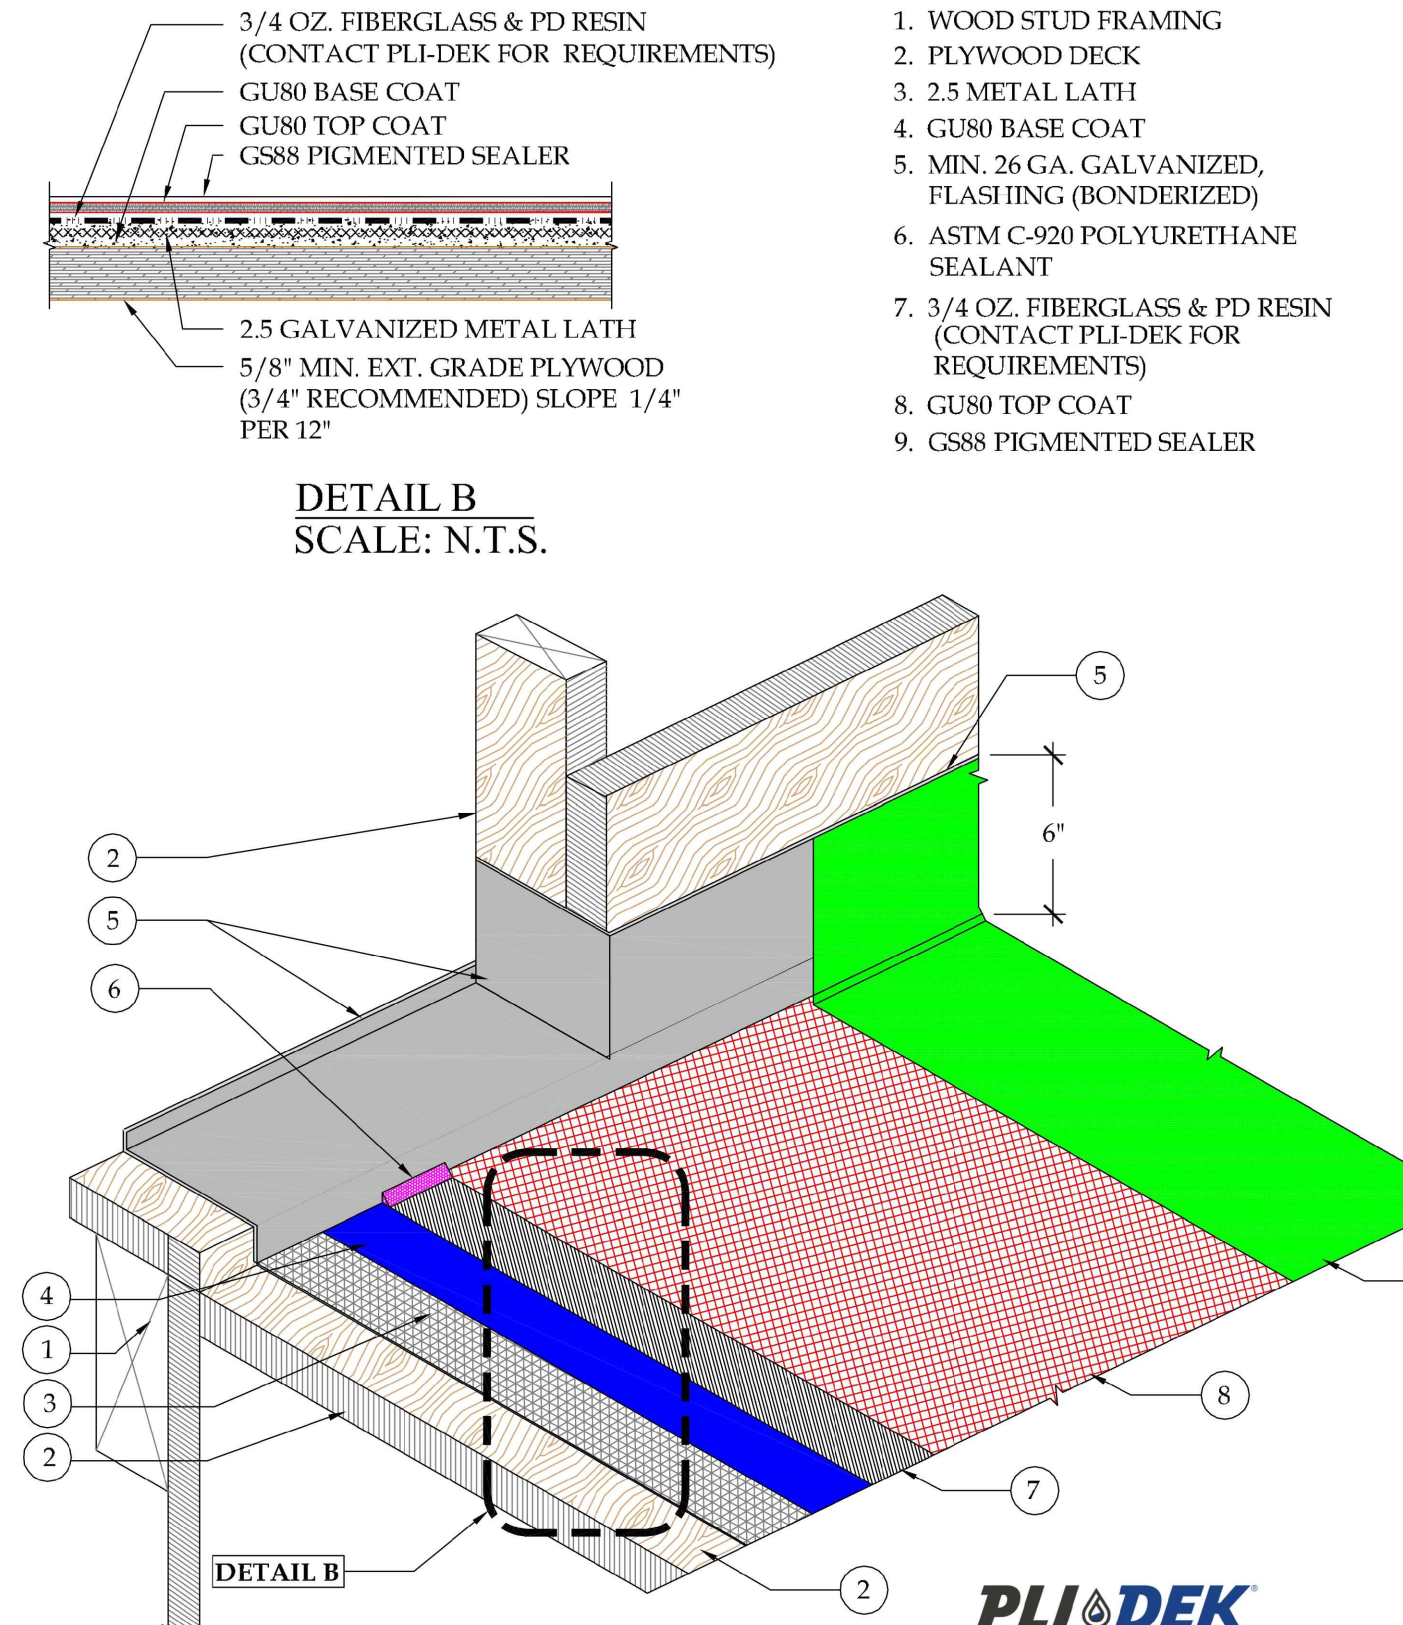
DETAIL-METAL DECK RAIL-UNDER WATERPROOFING MEMBRANE
